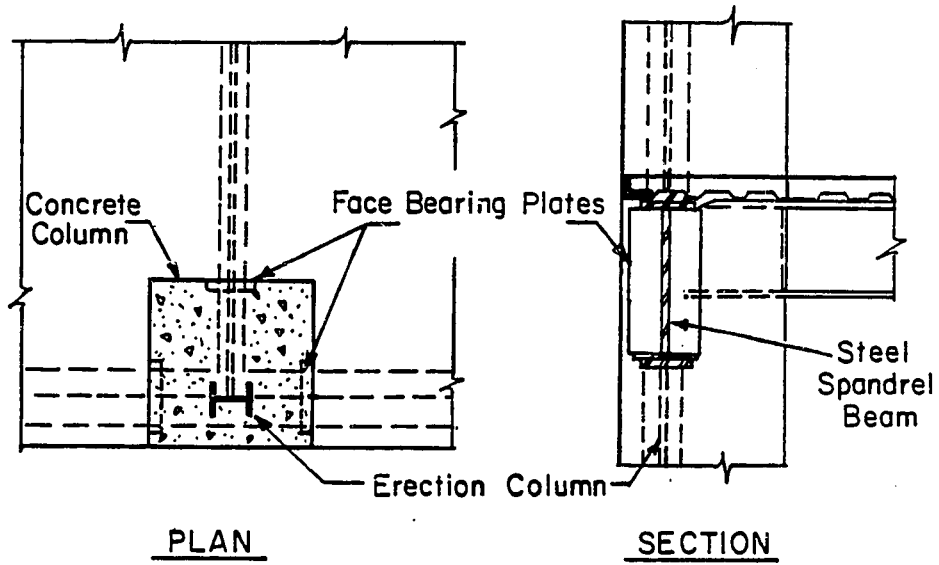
Composite framed tube system details with steel spandrel beam.
